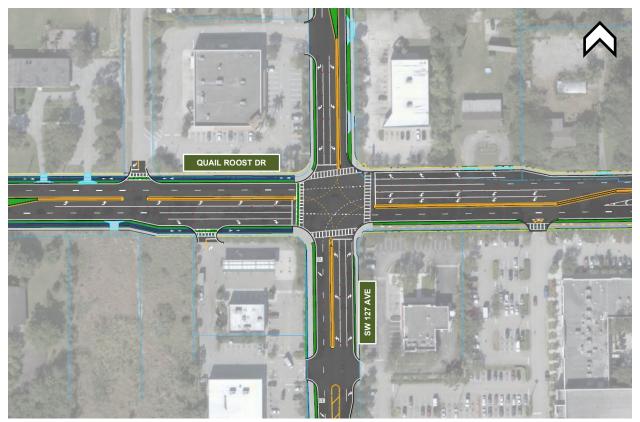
SR 994/Quail Roost Dr and SW 127th Avenue Intersection
